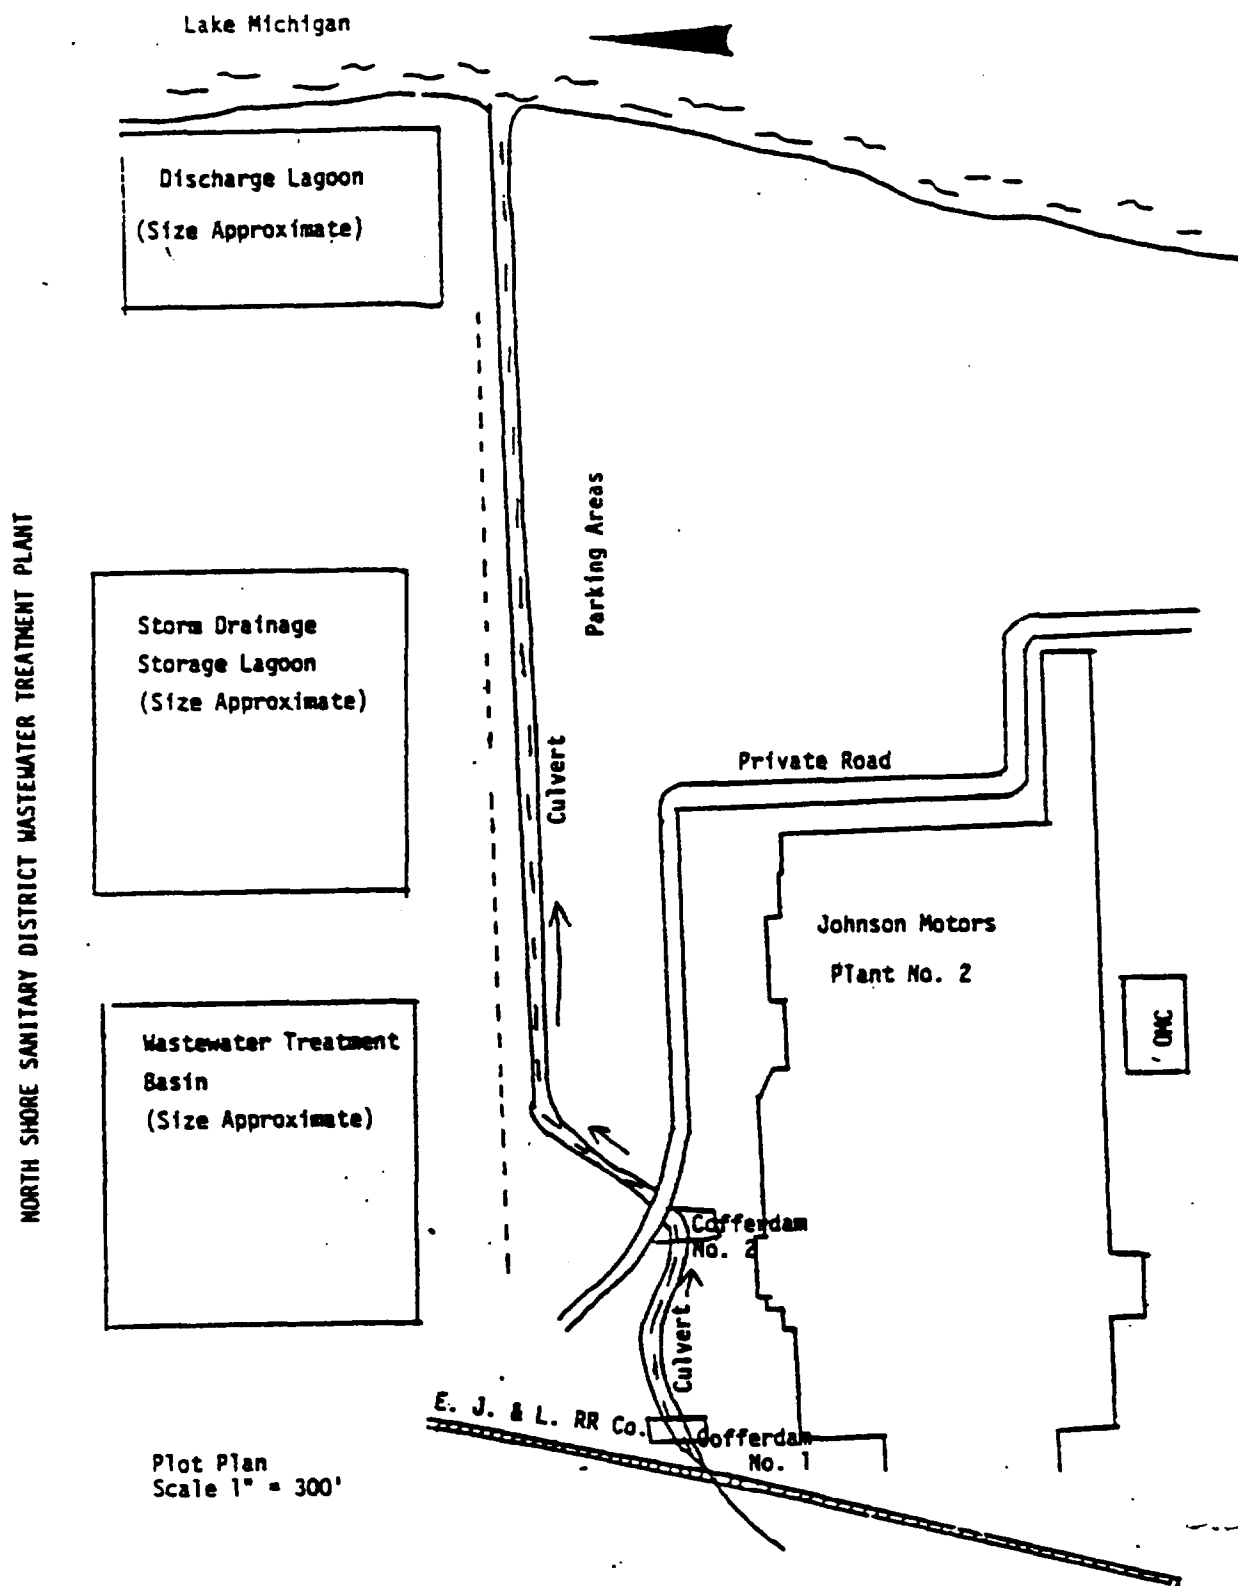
Placement of Interim Stormwater Rerouting Lines and Cofferdams
